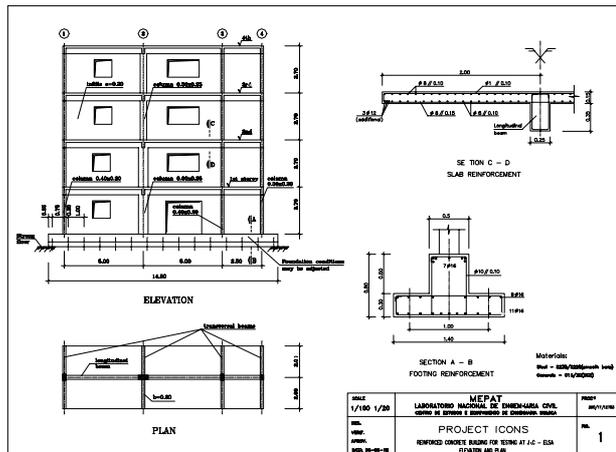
Plan and elevation views of concrete frame plus masonry infill building
